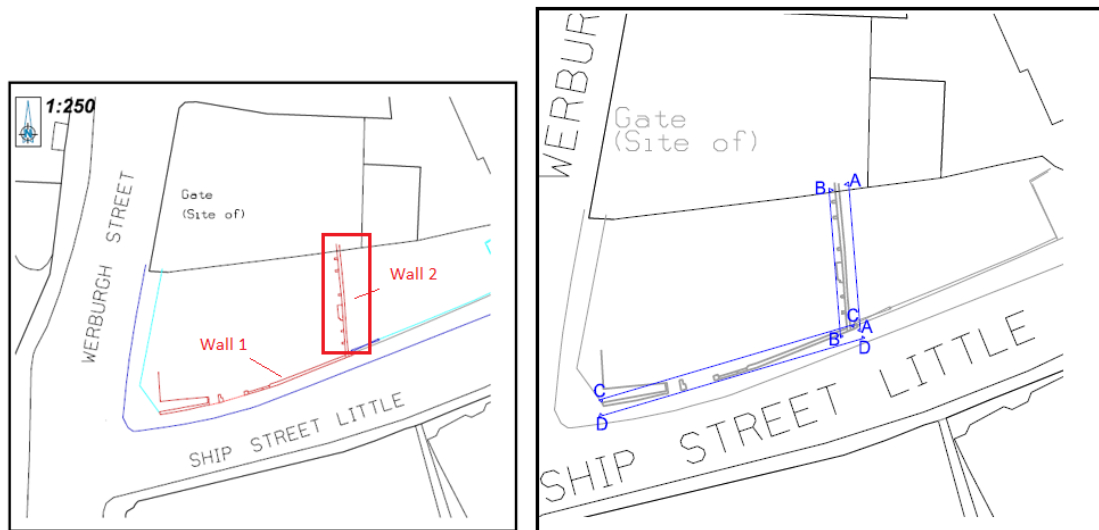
Wall 2 bisecting Site 4 and abutting the City Wall
